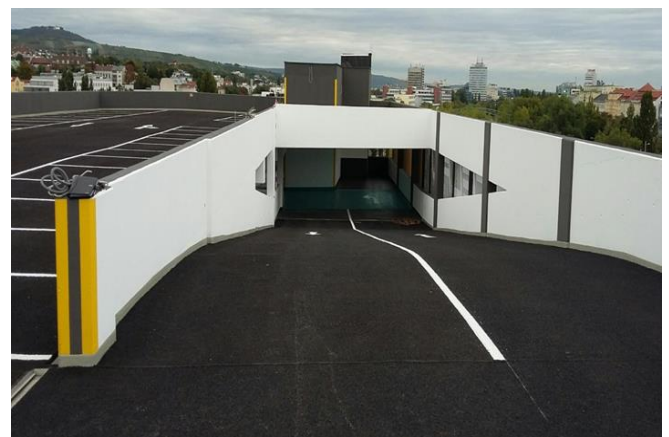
Ramps in the outdoor area with protective or levelling layer on waterproofing + 3.50 cm mastic asphalt split off (for skid resistance)
